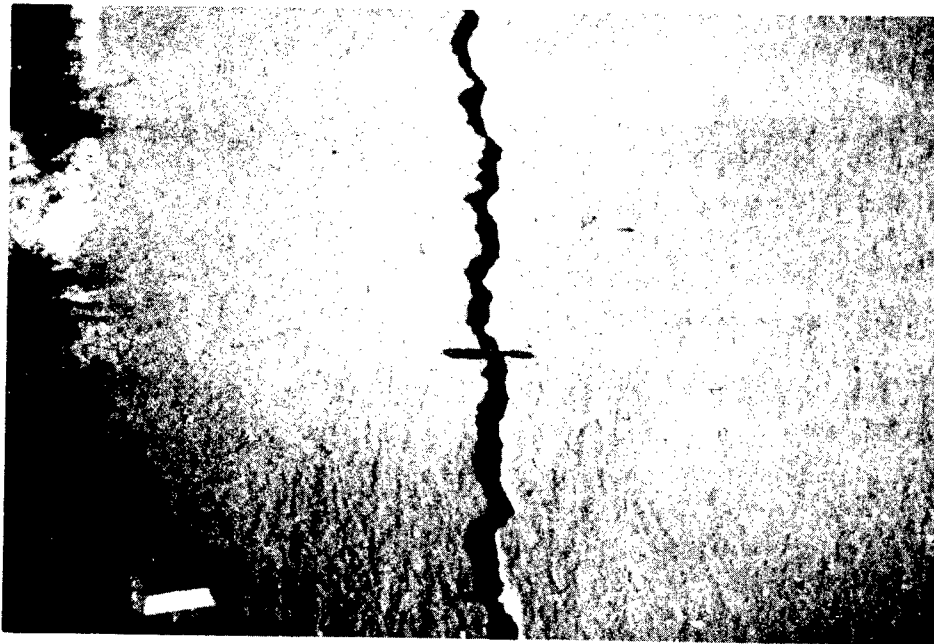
High severity longitudinal crack, jointed rigid pavement, case 2
